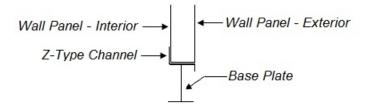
21 16 – 2: Cross Section Wall-Panel Base Z-Type Channel
